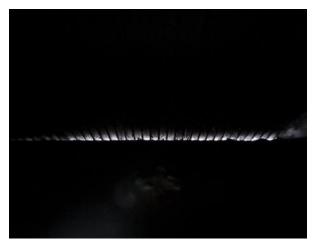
Outbuilding - loft - light entering Figure 22: Outbuilding - loft - jackdaw nest. underneath the end of corrugated asbestos roof.
